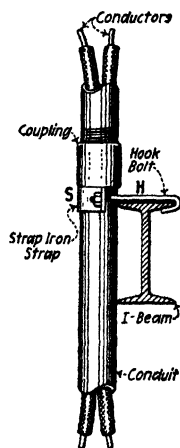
Vertical conduit supported with strap and two hook bolts.
